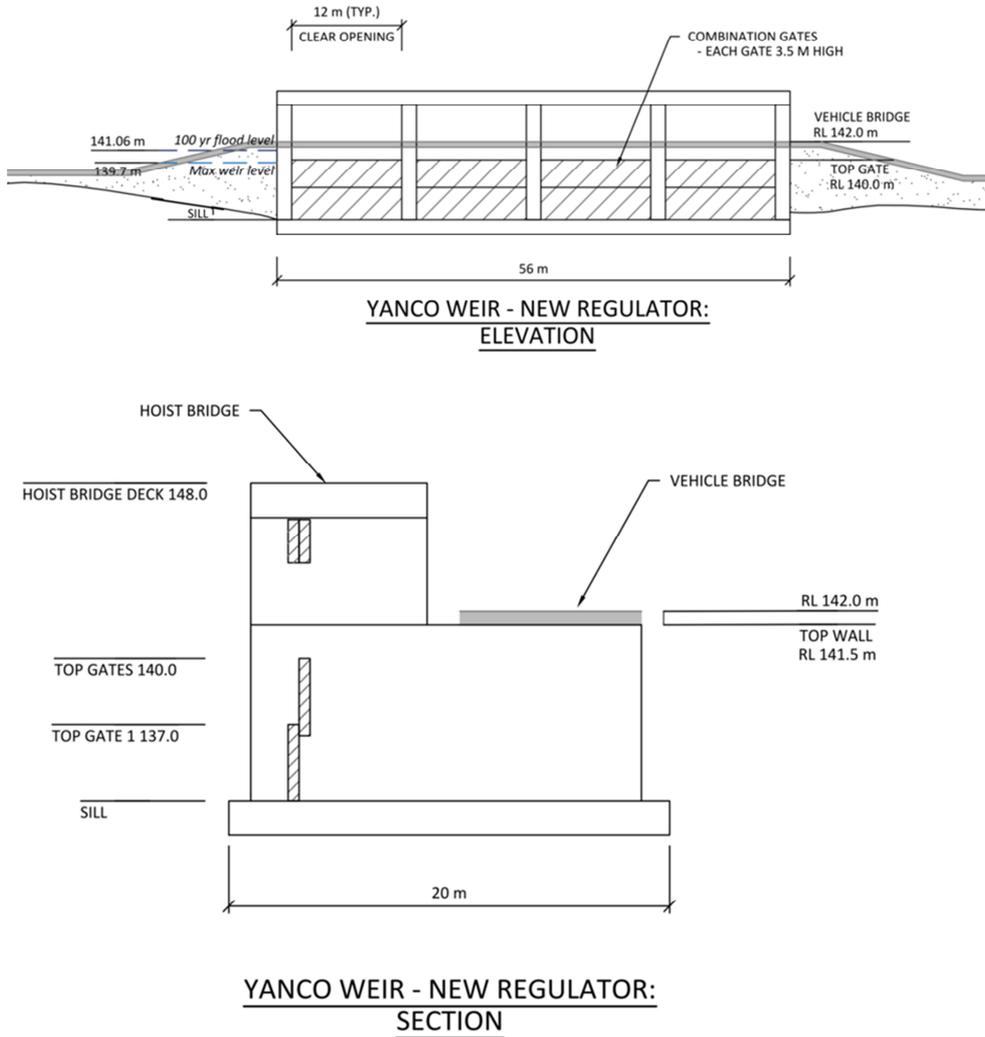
Schematic showing new Murrumbidgee Regulator at Yanco Weir, including approach ramps and access road
